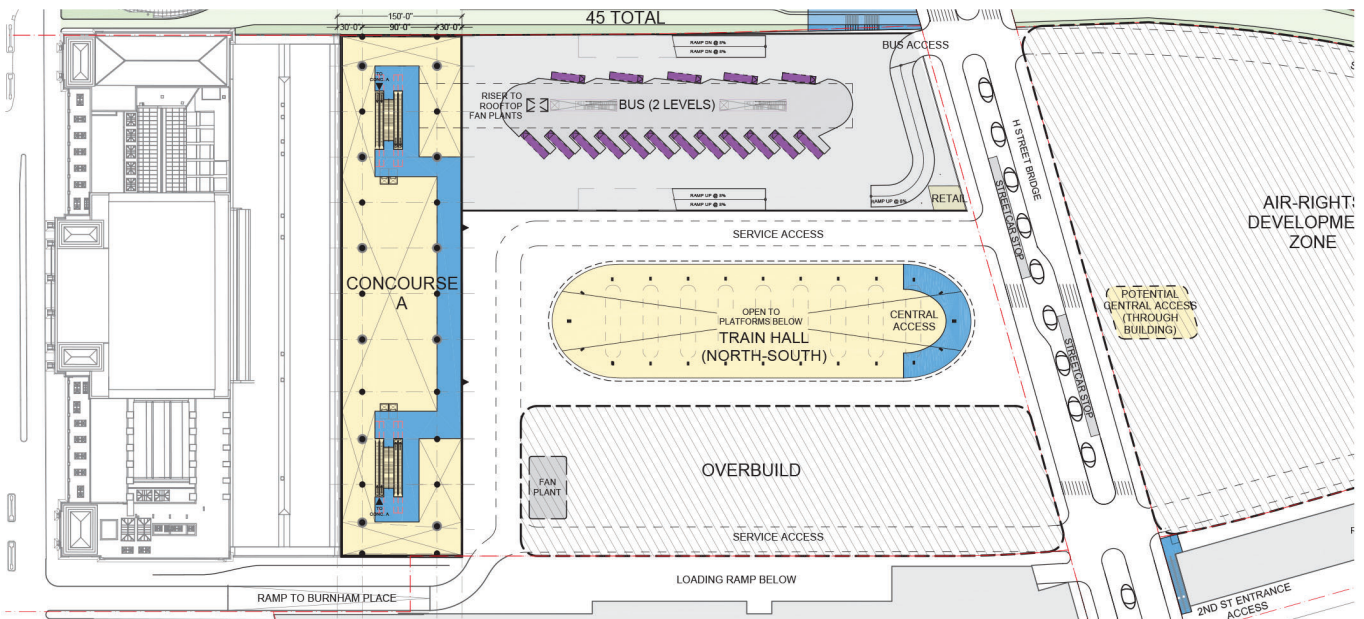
Bus on South-West: Partial Plan at Bus Deck Level
